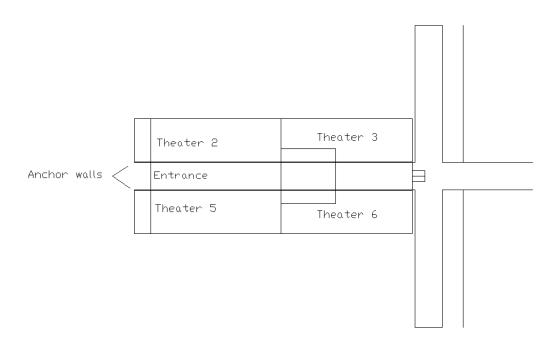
The walls of the theatre will function as an anchor for the bridge.
